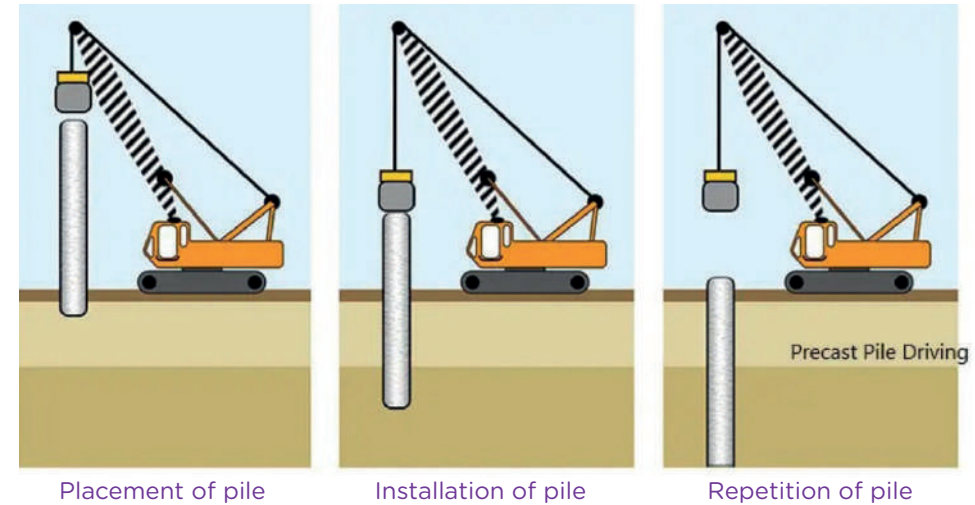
Example of one method used for installing pre-cast piles (Source: Structural Guide)
